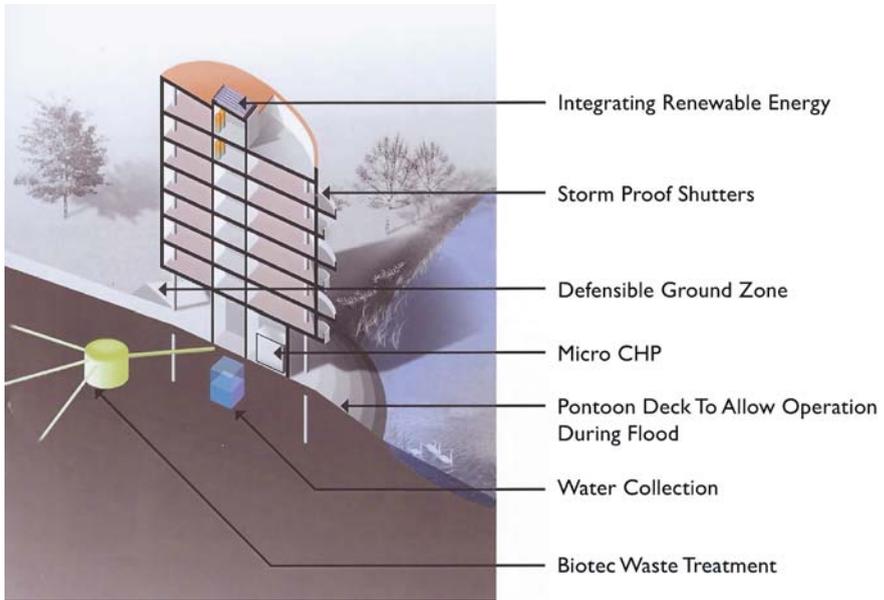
Lifted building (Source: Baca Architects, London, 2007)
